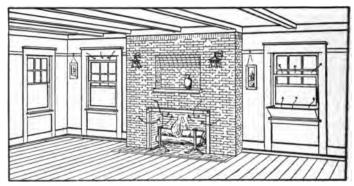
How a fireplace and a window board help to ventilate a room. The arrows show which way the air is moving.
